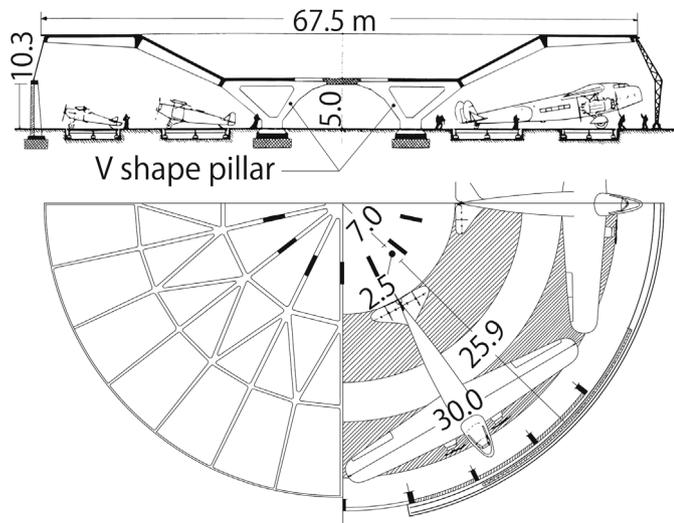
Section and plan of a circular hangar in reinforced concrete (RC)
